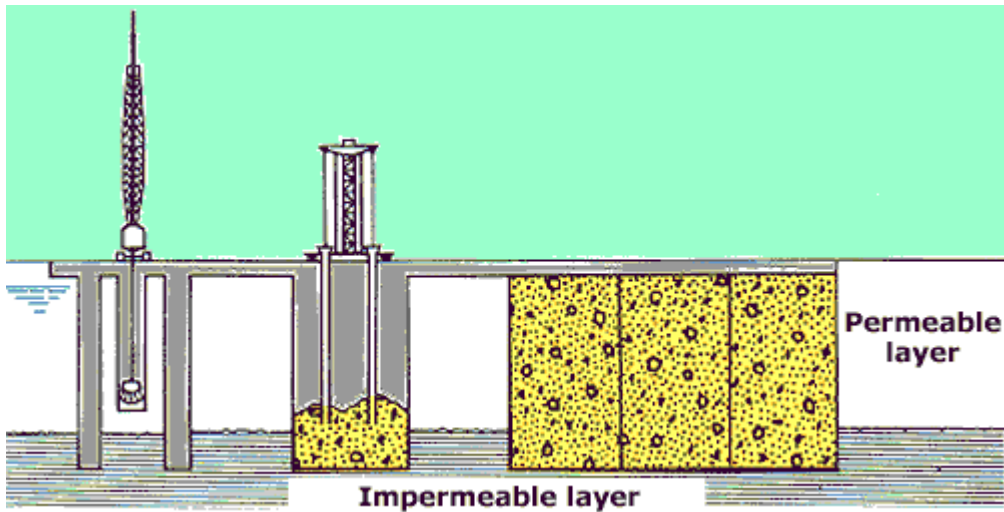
Stages for Construction of Concrete Plastic Cut-off Walls
